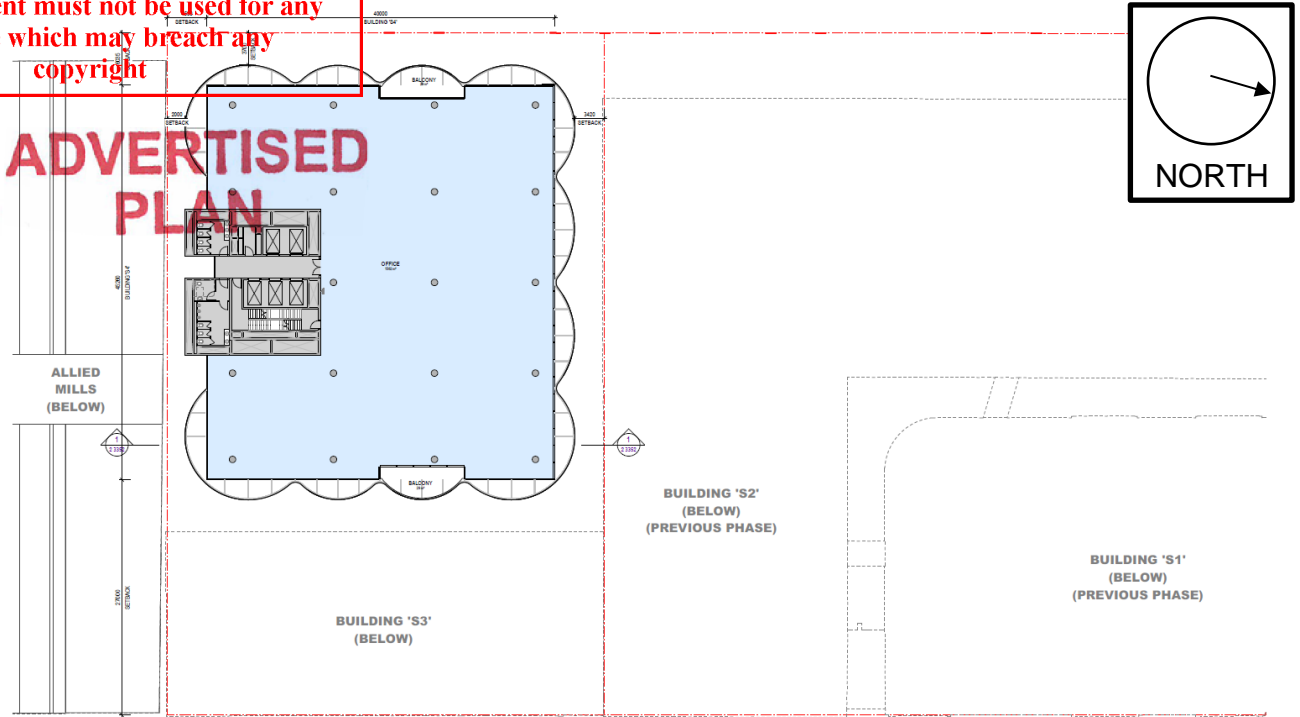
Level 7 floor plan of Stage 2 of the proposed 2-50 Elizabeth Street development
